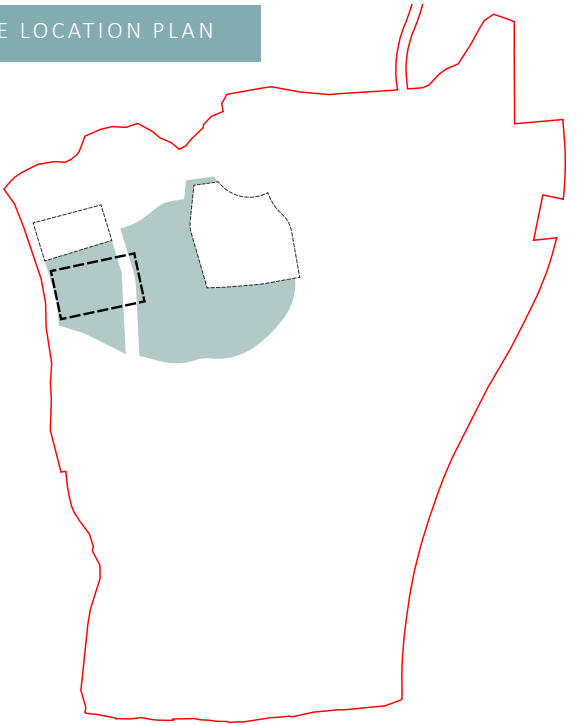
ILLUSTRATIVE PLAN VIGNETTE
